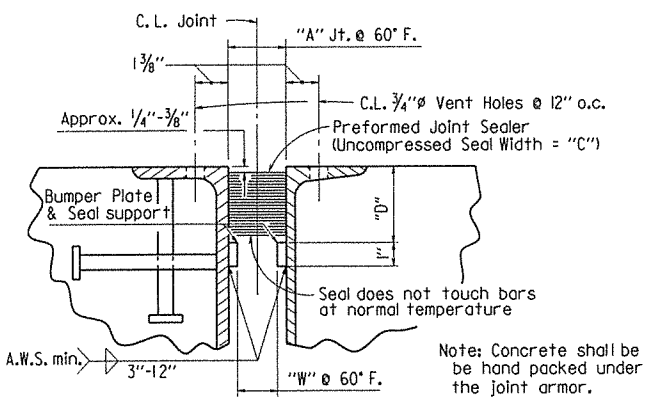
DETAILS FOR BLOCKING EXPANSION JOINT DEVICE
